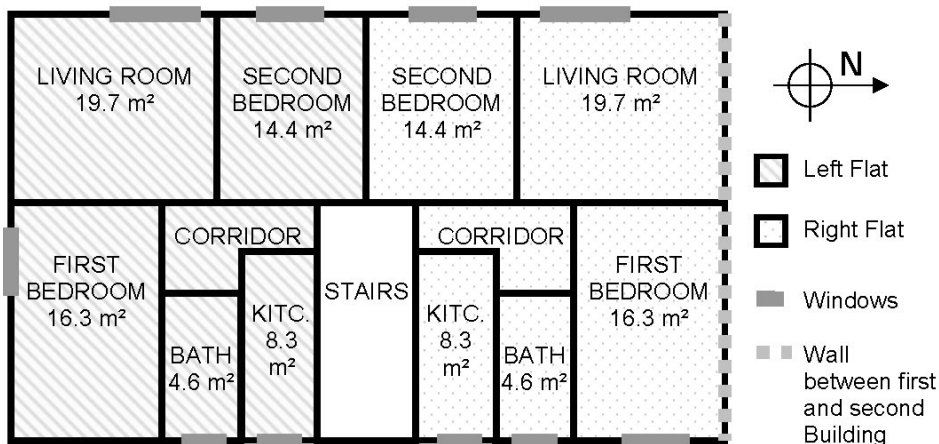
Qualitative layout of one floor of the first entrance of each building / KITC. is the Kitchen.
